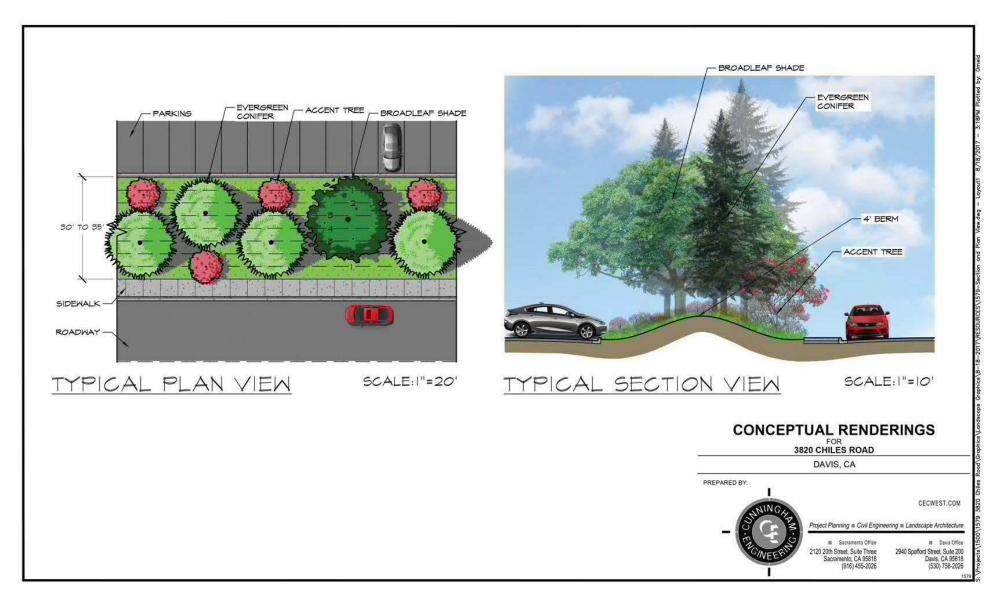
PROPOSED CHILES ROAD WIDENING
